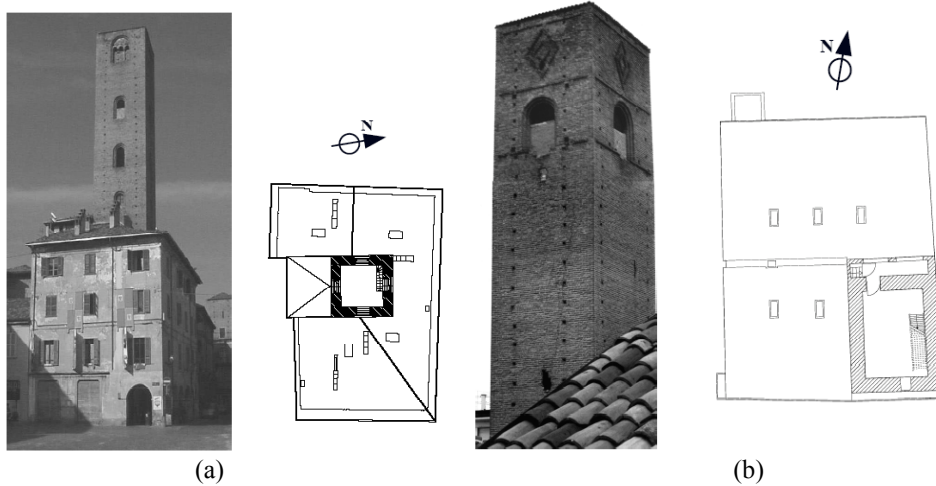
Elevation view and plan of the towers with the surrounding buildings: Torre Sineo. (a), and Torre Astesiano (b).
